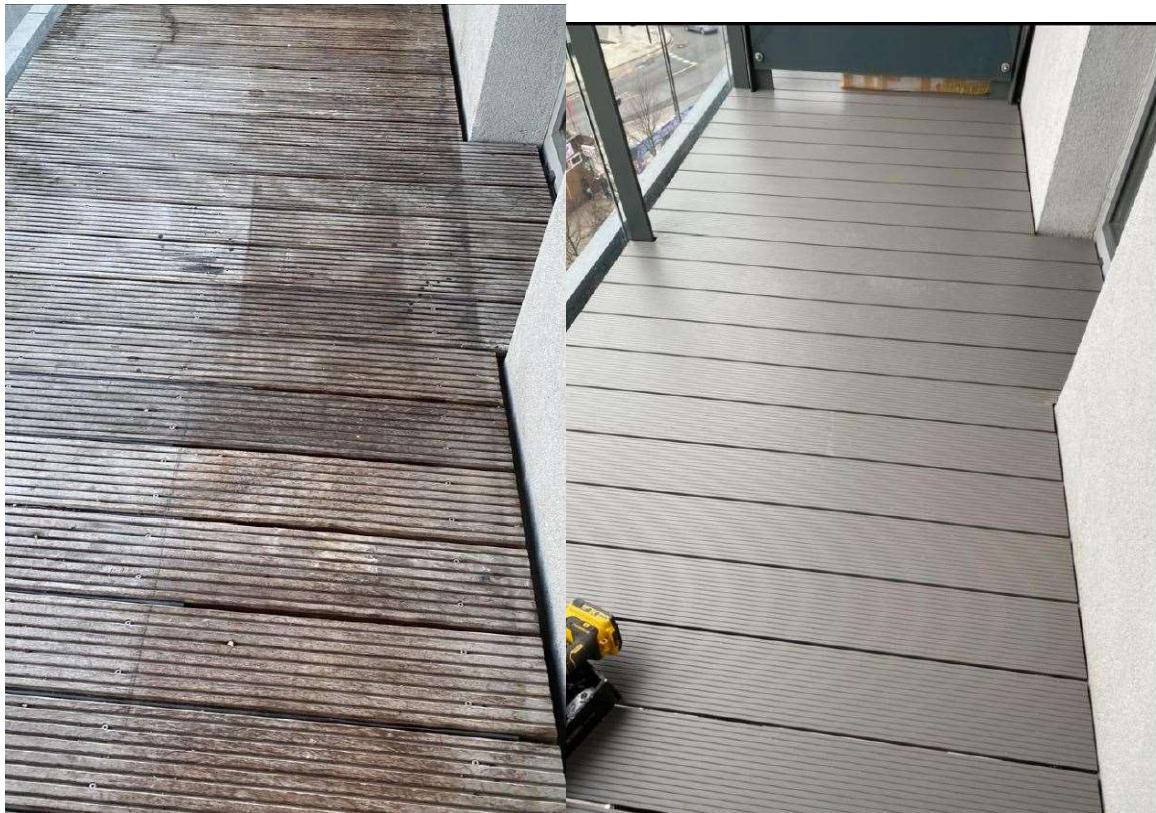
Fourth Example of a completed balcony decking replacement; the left-hand side photo shows the original timber decking balcony, the right-hand side photo shows the same balcony and the completed aluminium decking replacement.
